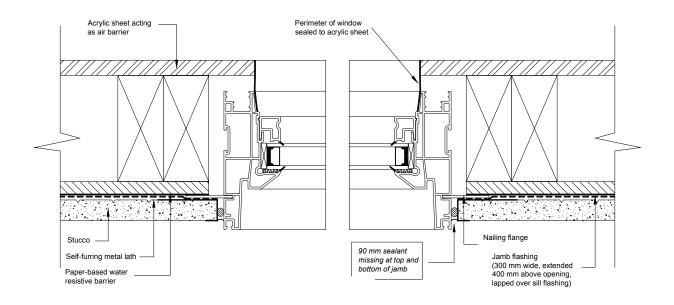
Wall/window interface for specimens No. 2 and No. 4- Horizontal section
